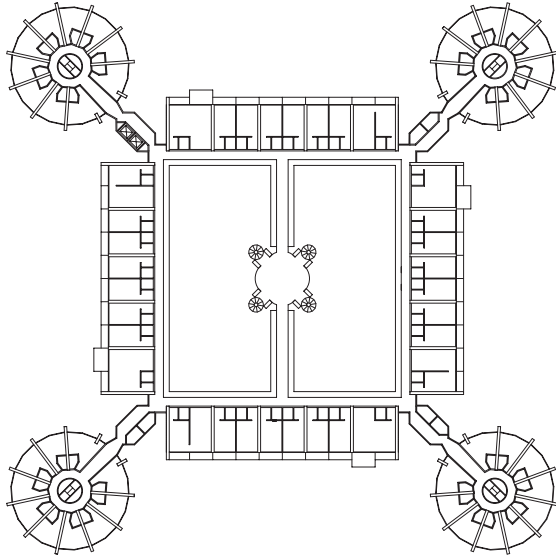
Typical guestroom floor plan of the Hyatt Regency O'Hare.
